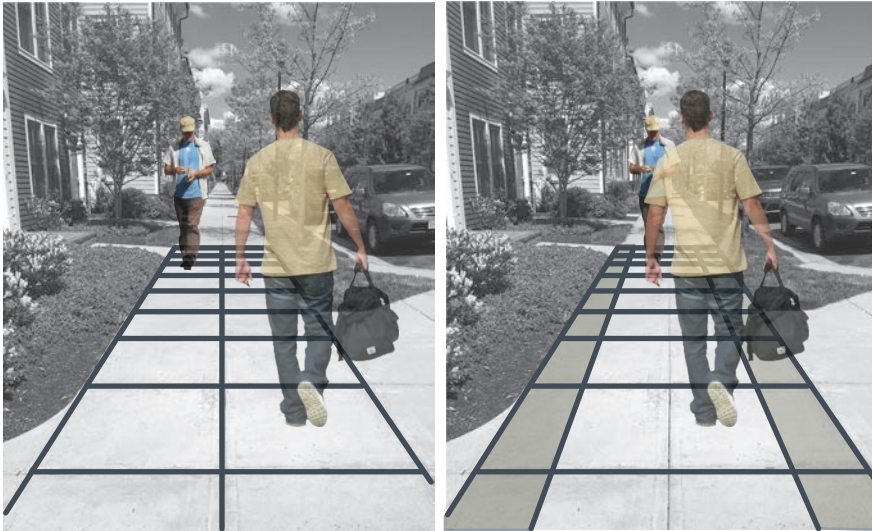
Sidewalk Scoring, Proposed Design. Previously redeveloped six-foot sidewalks in the Braddock Metro Neighborhood contain score lines that delineate two separate pedestrian lanes (left). The proposed design (right) would set score lines that create the effect of an existing four-foot sidewalk, reinforced with a colored edge, to meet accessibility requirements but subtly encourage residents to drift toward the middle of the sidewalk, requiring them to engage and move aside when encountering a passing neighbor.
